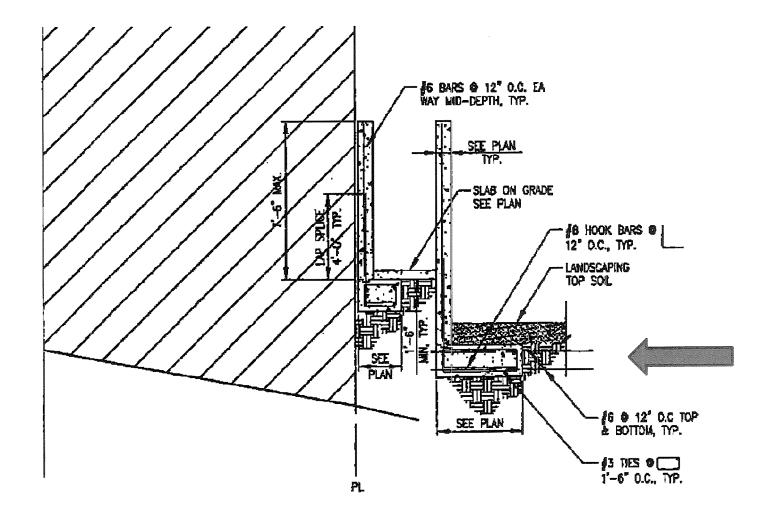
Detail 3 on Sheet S4.1 of Building Permit Application No. 201705116316
